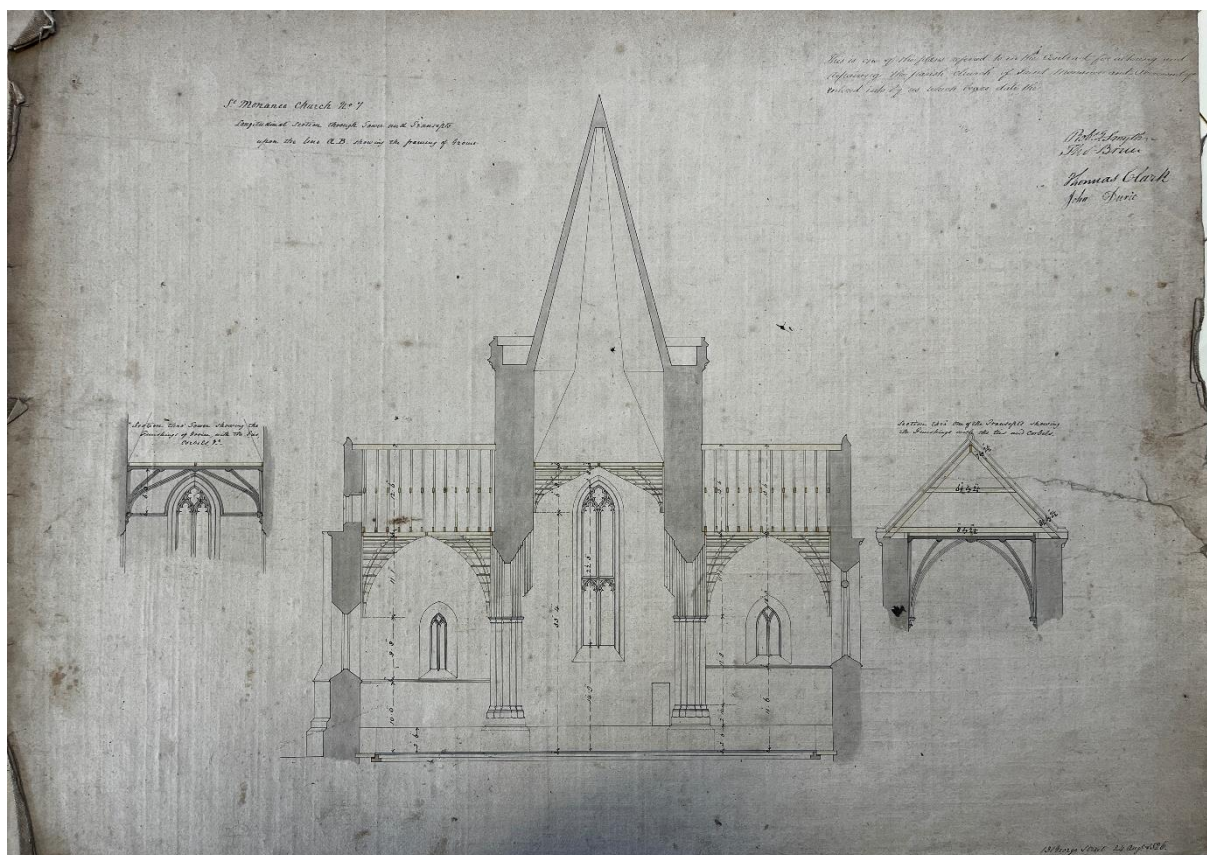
William Burn; section through tower towards west, 1827 (courtesy of the University of St Andrews Archive Collection)
